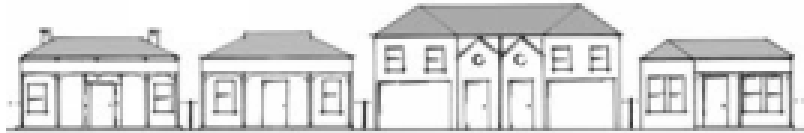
New development incorporates garages into the new dwellings and dominates the streetscape.
